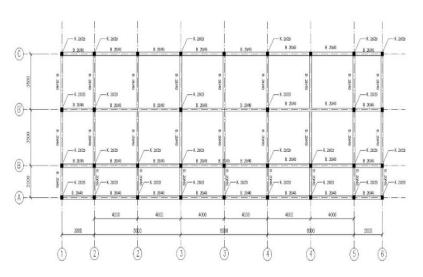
Floor plan of columns and building blocks TK B Source : Personal document image
